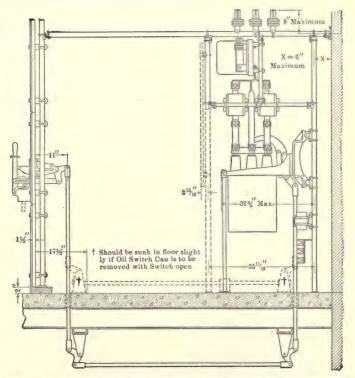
Arrangement of 2300-volt Switchboard with Mechanically Remotecontrol Switches Mounted on Open Pipe Work.
